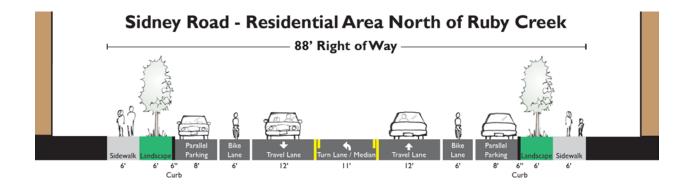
Sidney Road SW. This road section would be used in the center to the north of the Ruby Creek crossing.
